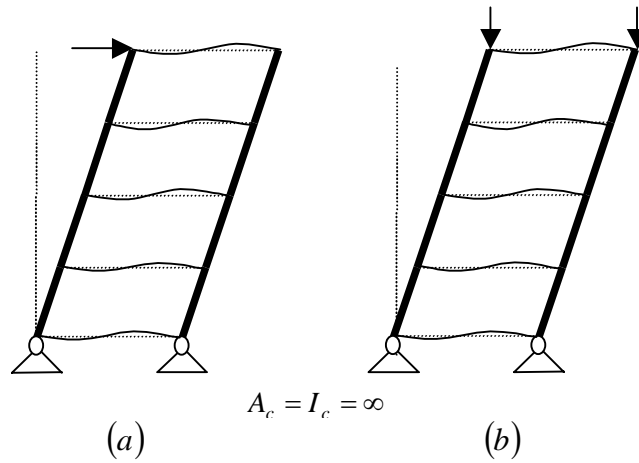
Racking shear shapes of the beams caused by top loads.
